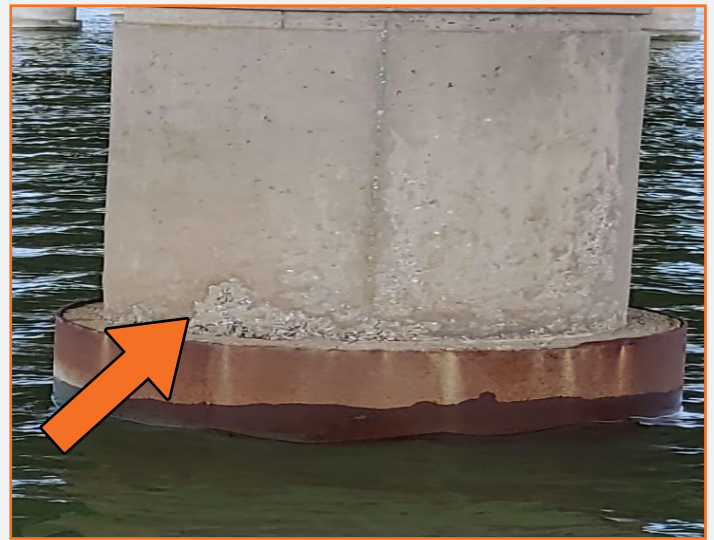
LTTB column spalling near bent No. 53 from West
